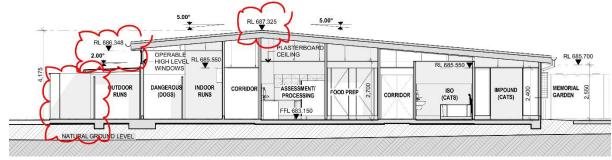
A: Animal Shelter building, Section – Solid light-weight partitions to outdoor dog enclosures – s.4.55 Modification (source: F&J Tepa)
